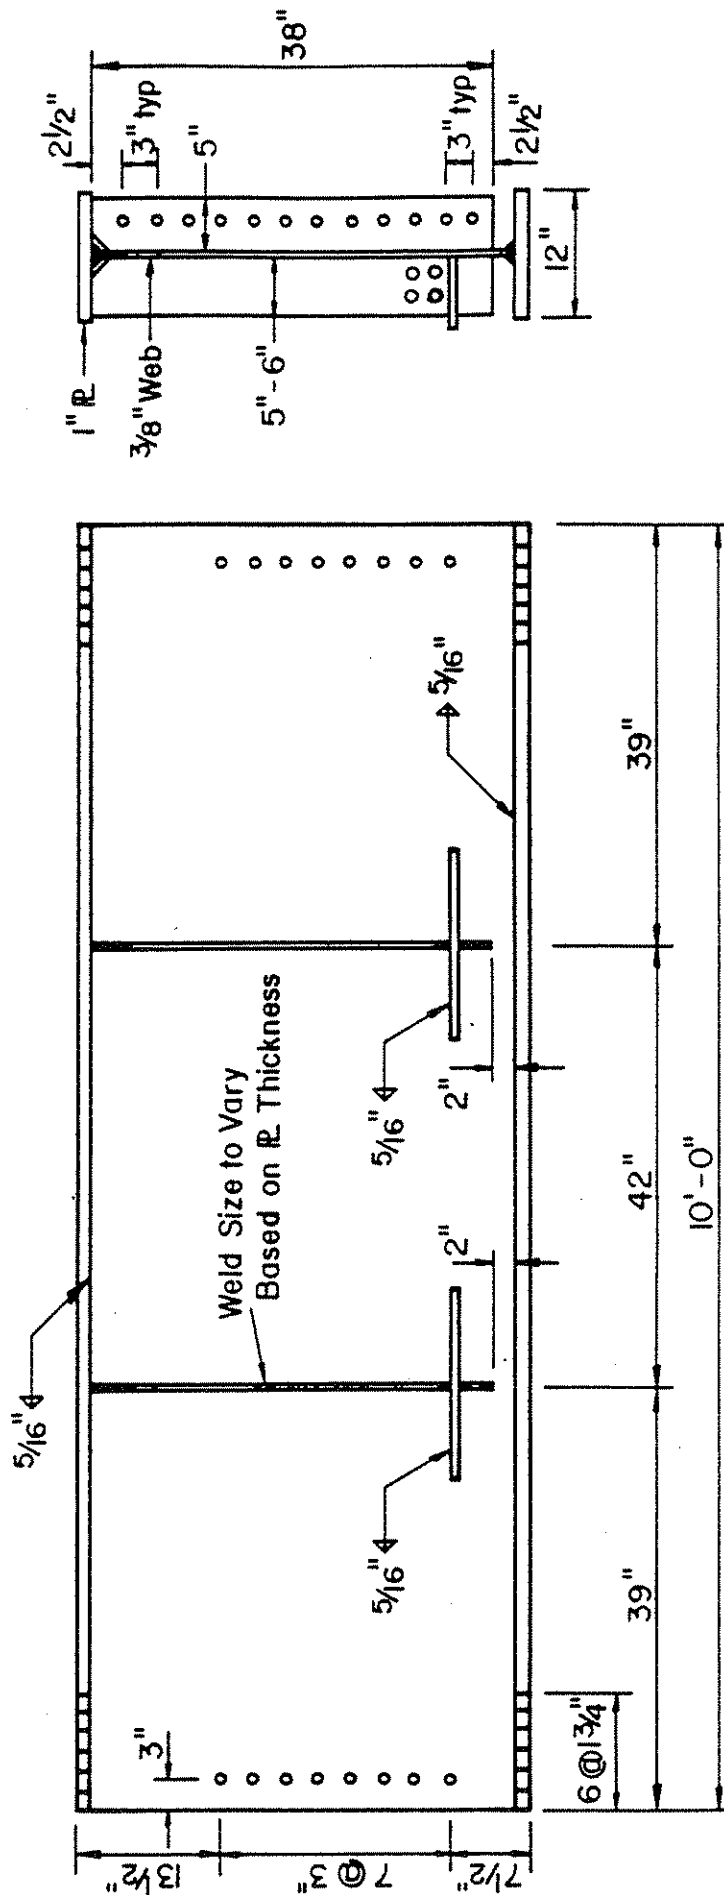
Test specimen for gusset plates framing around transverse connection plates
